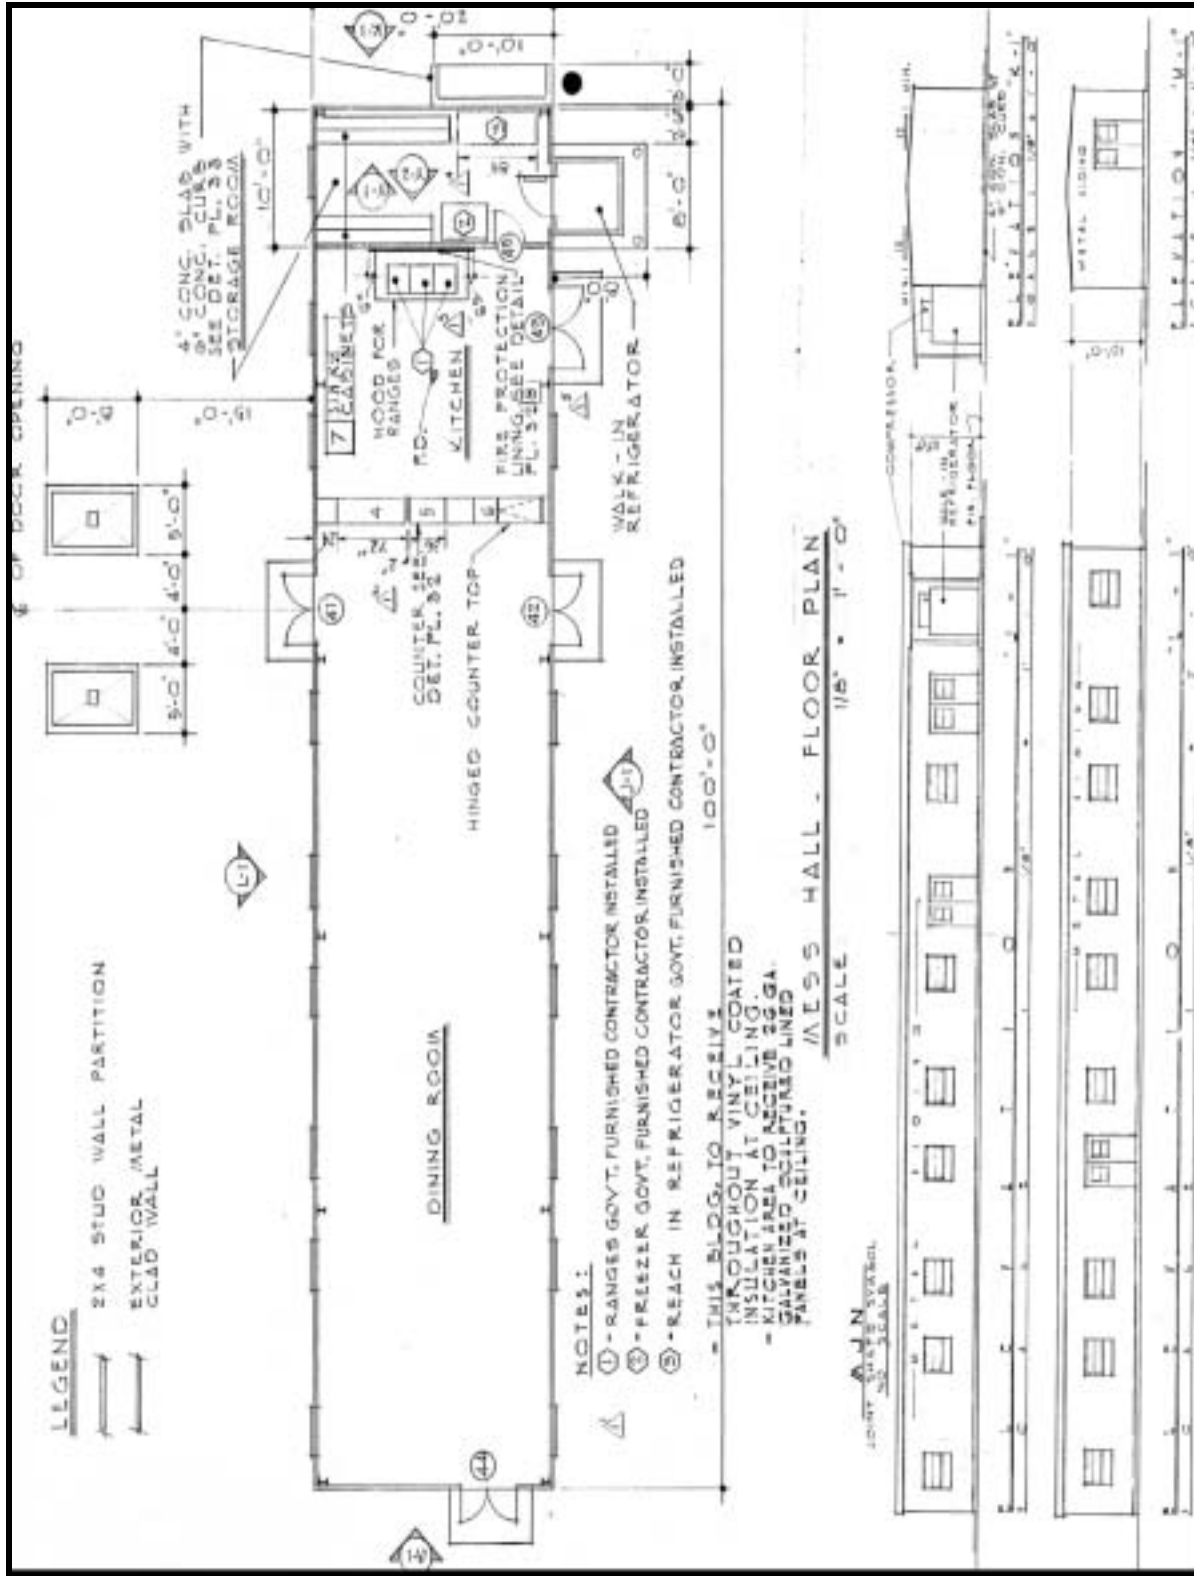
Mobilization dining facility, elevations and floor plan, Dona Ana Range, Ft. Bliss (1966, revised 1967) (Engineering, Ft. Bliss).
